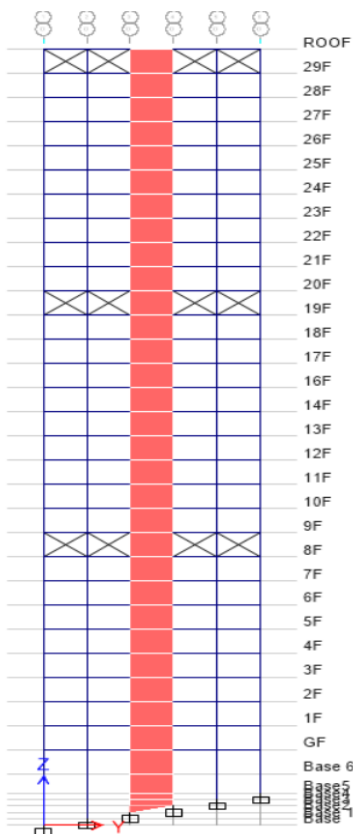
Elevation view of three outrigger bracing system for 10 degree sloping ground.
